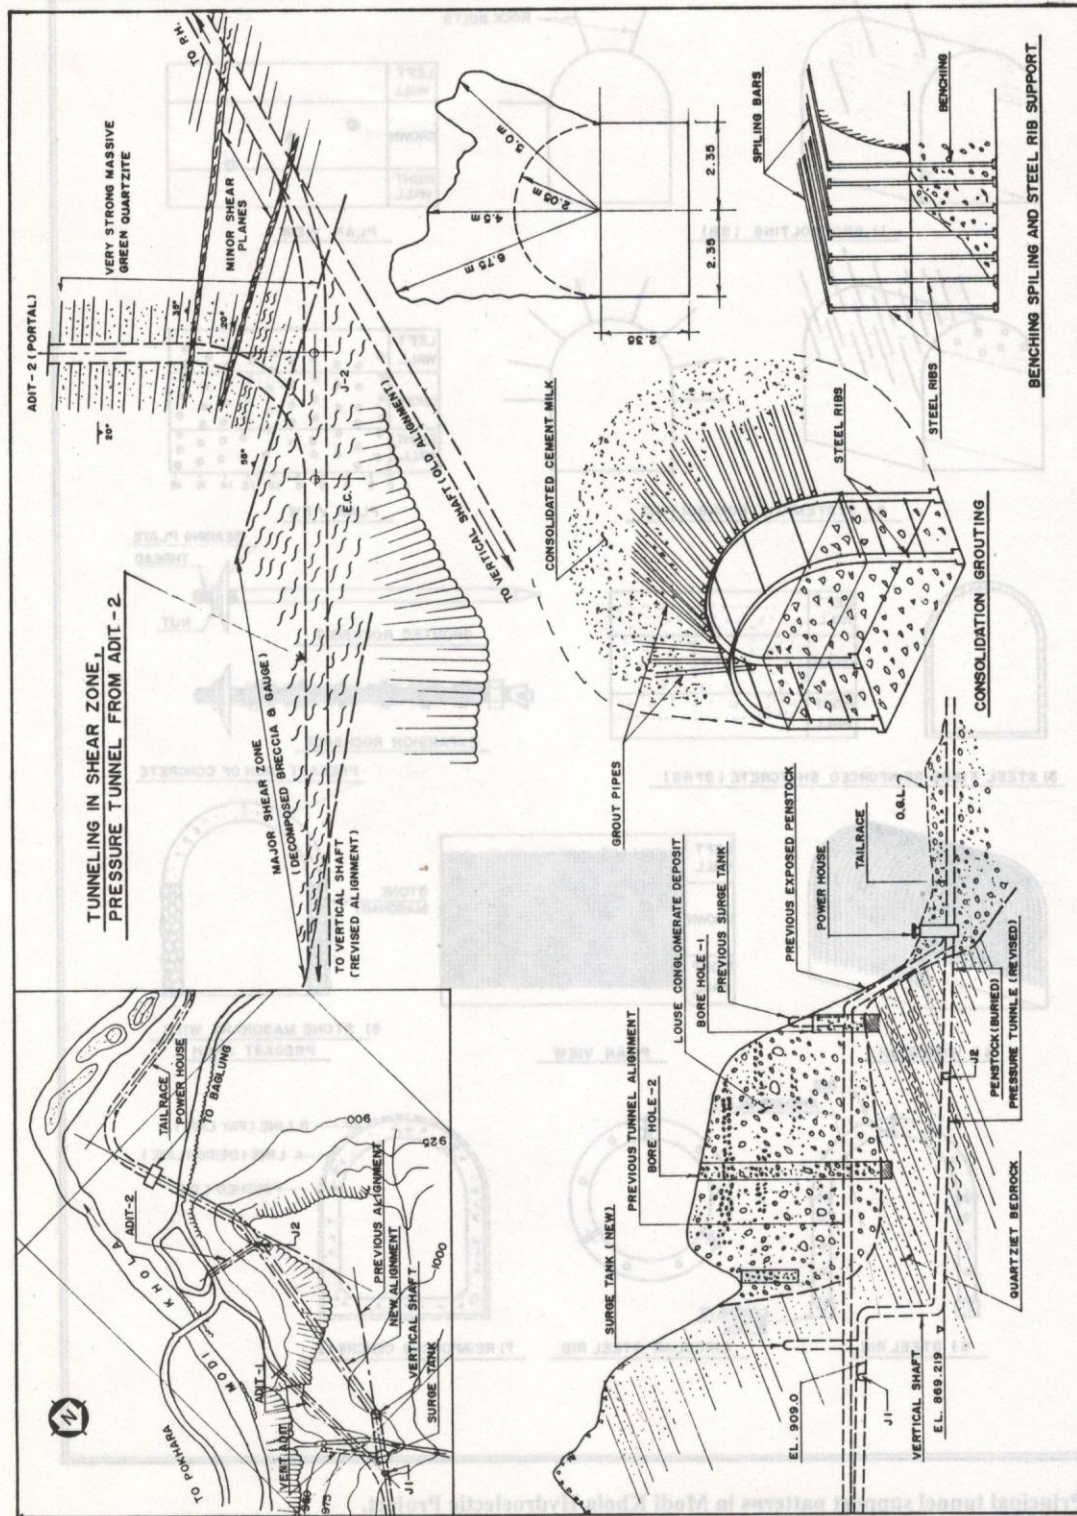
Tunneling through shear zone in the pressure tunnel.
